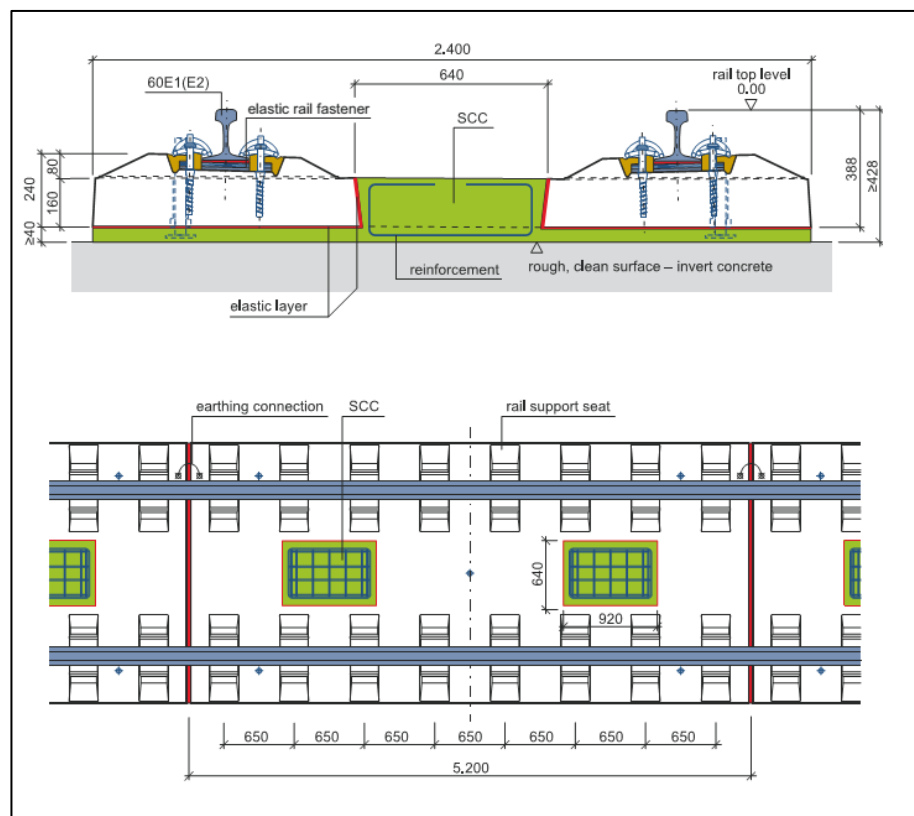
Cross section and top view of ÖBB-PORR (PORR)
